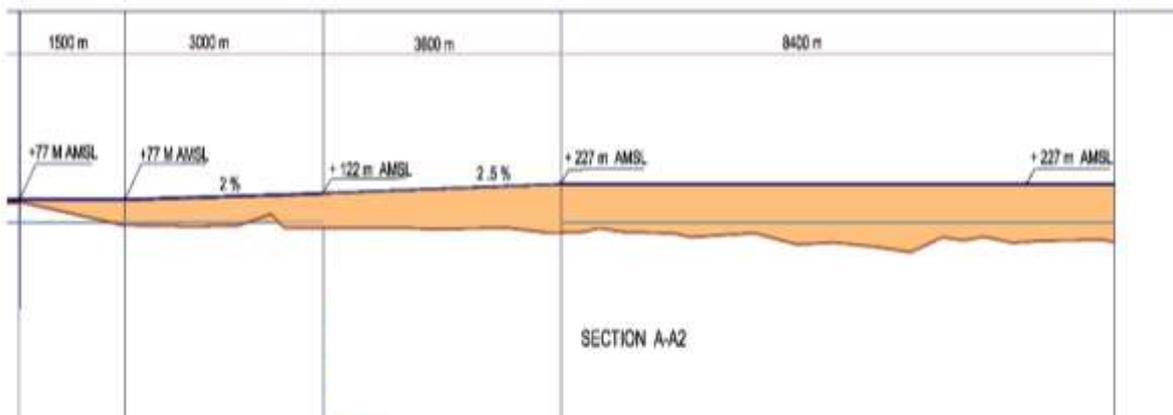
Section A-A (Longitudinal section – Approach direction)
